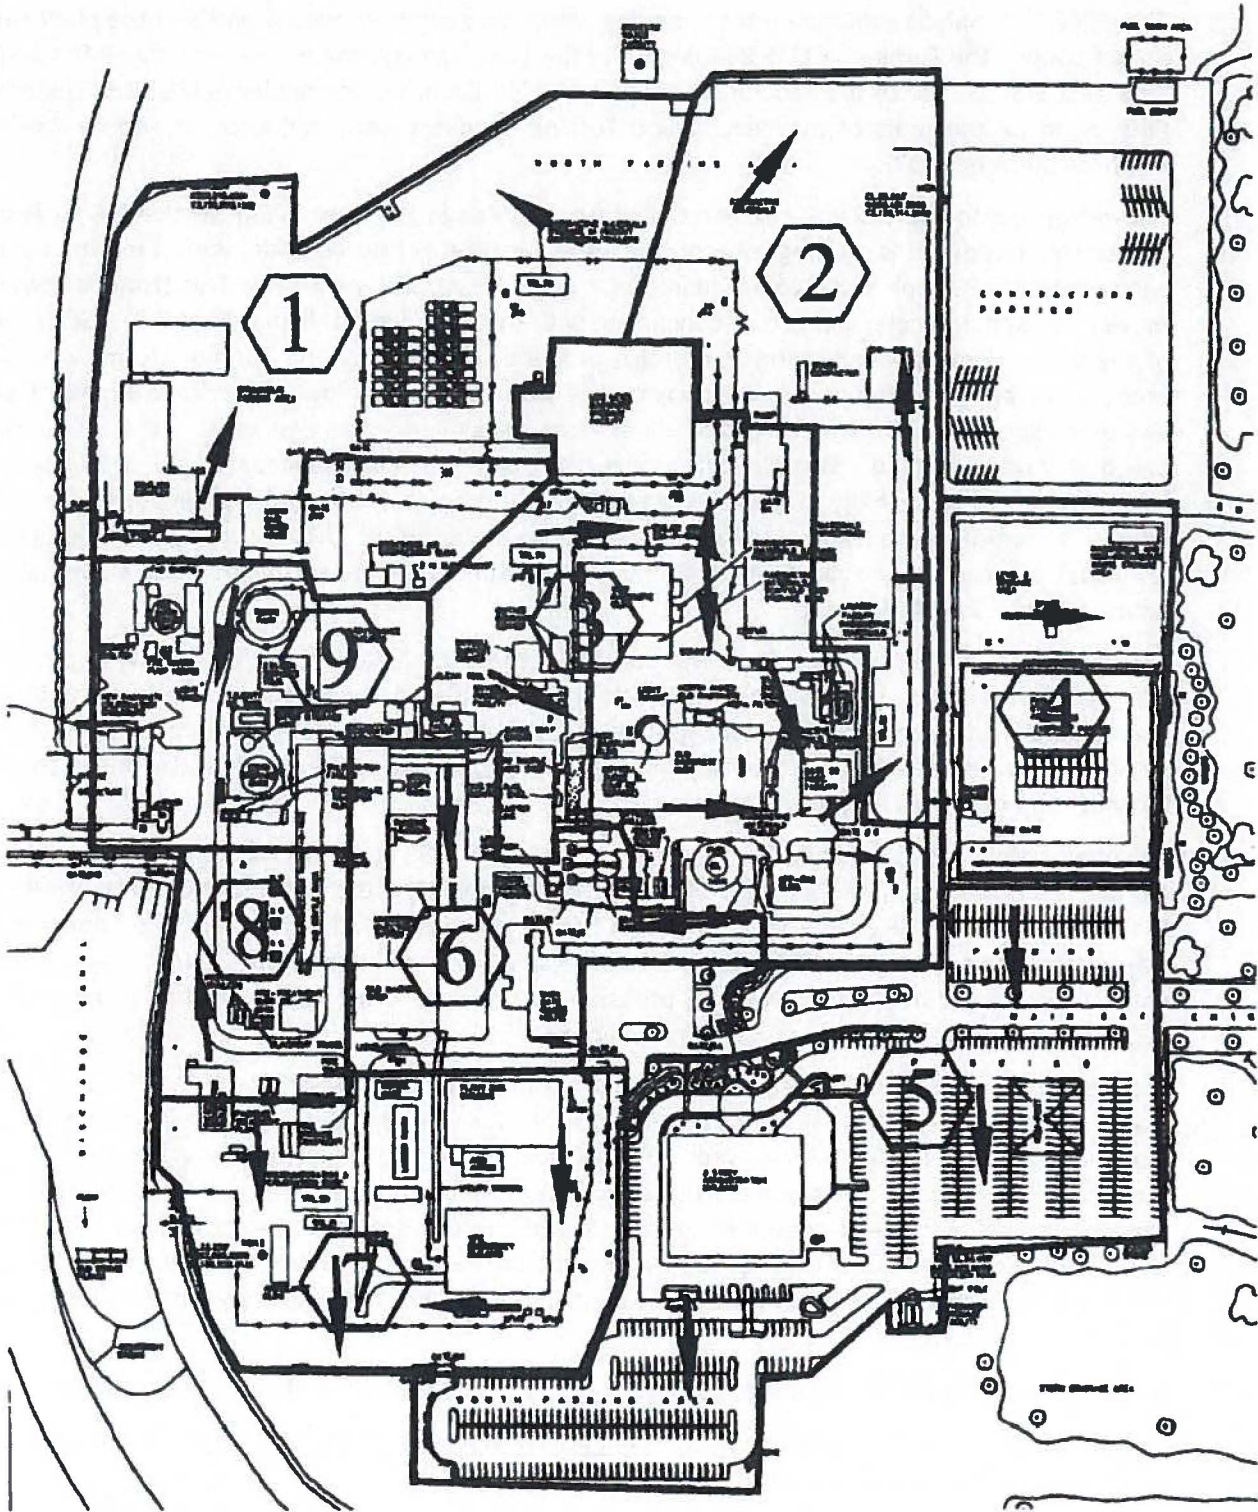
Site Plan View showing Subcatchments (Ref 37, Page 31, Figure 8)
